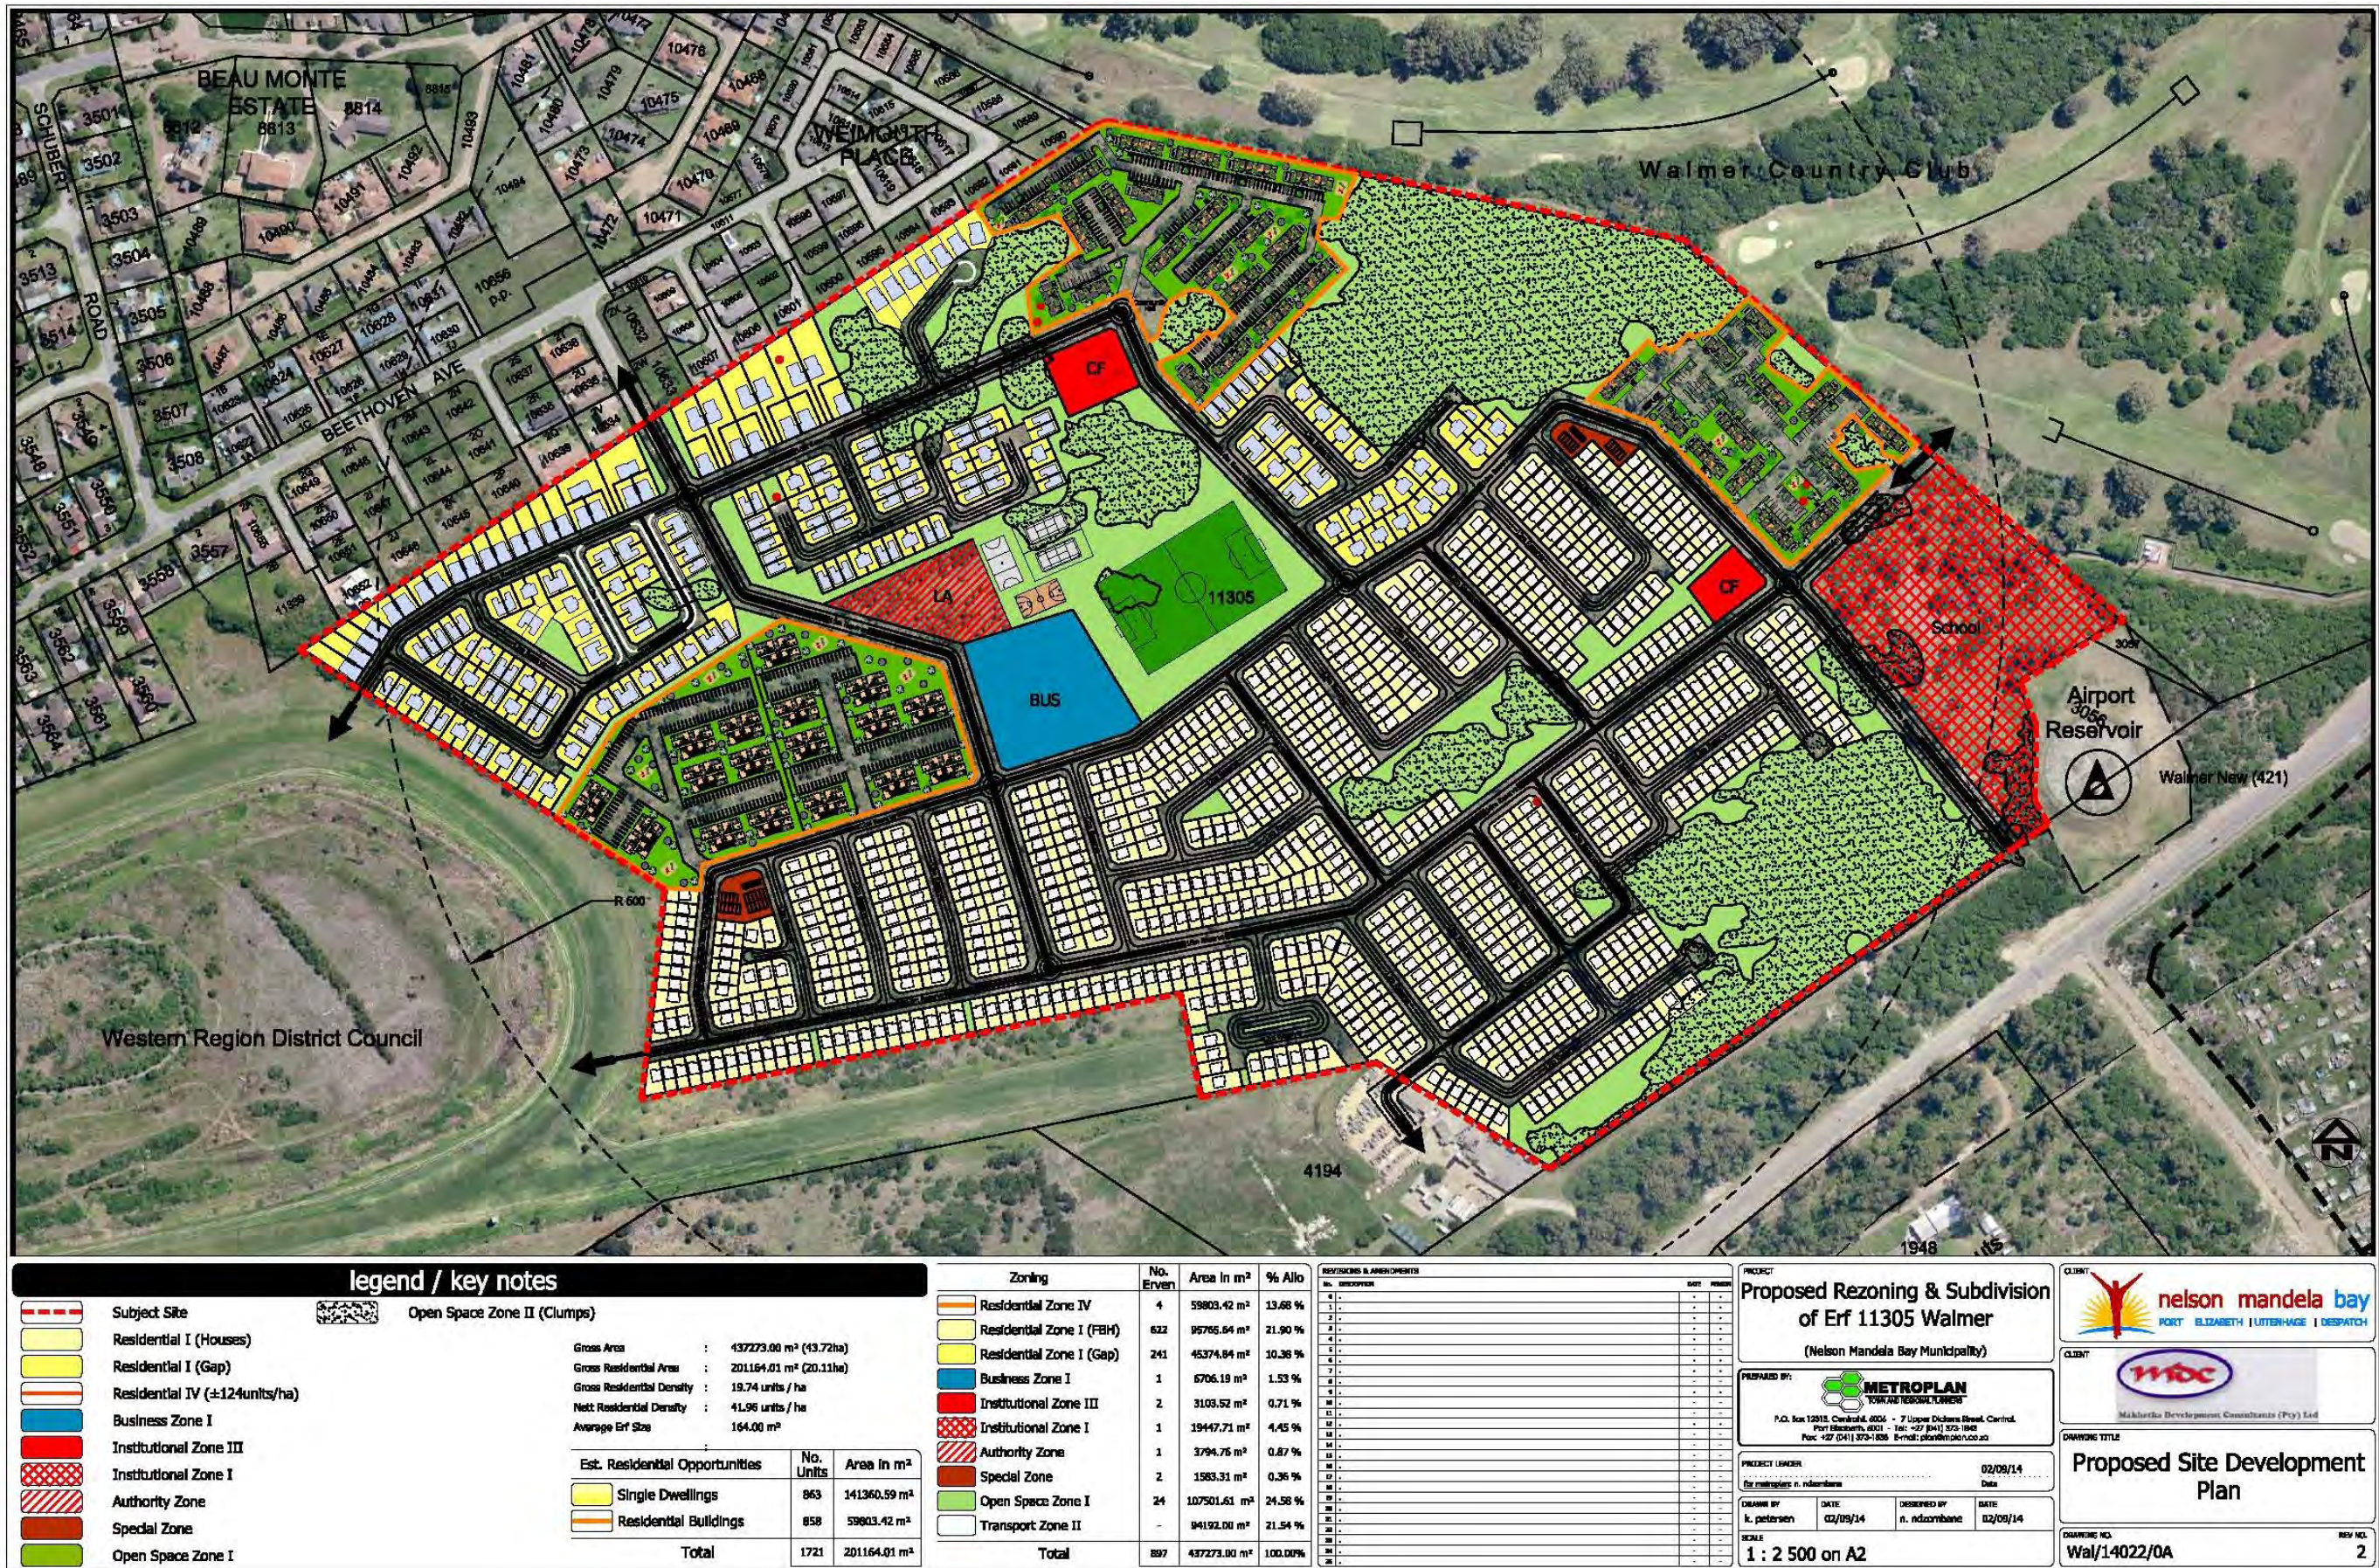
Preliminary site development plan for Walmer erf 11305 housing development
